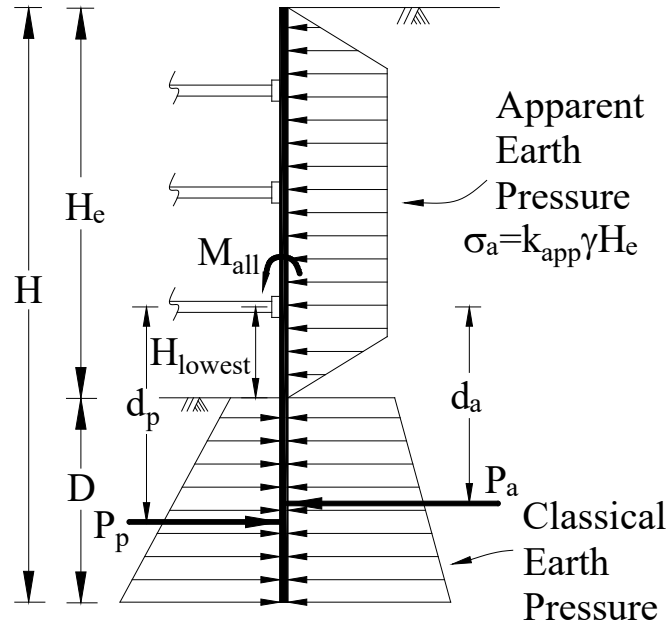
Assumed pressure distribution for the excavation support wall.
